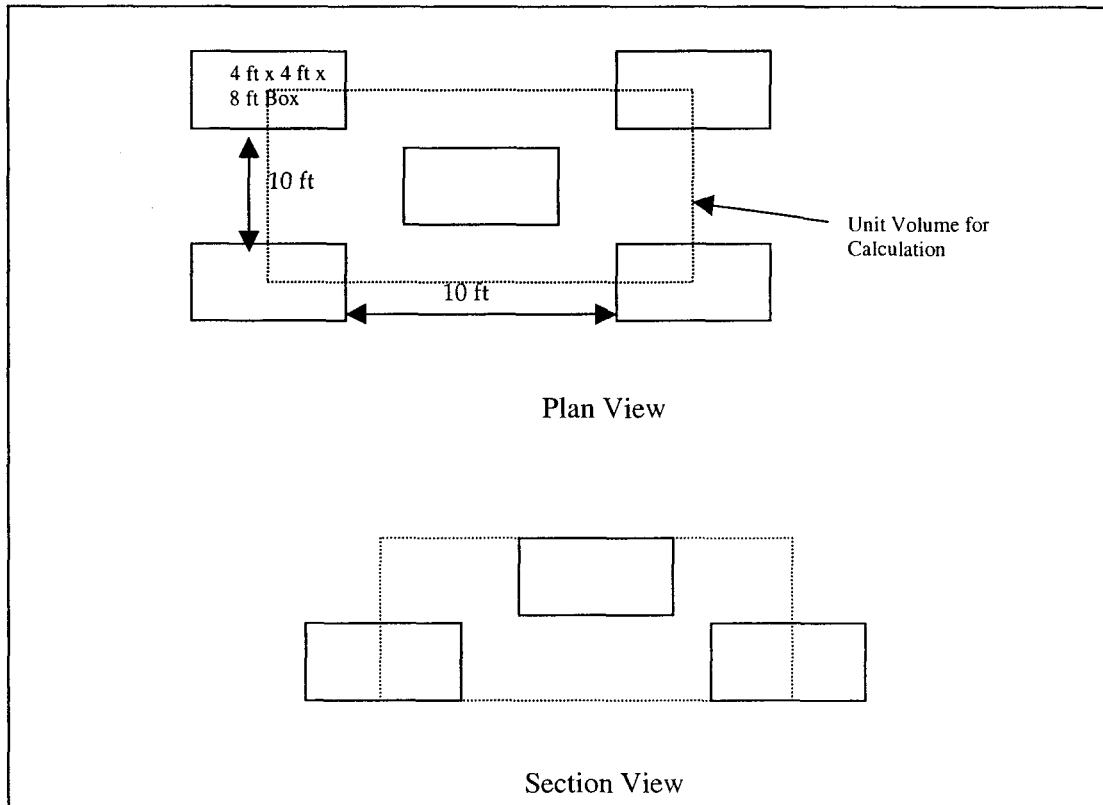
Plan and section views for 4 ft × 4 ft × 8 ft boxes.
